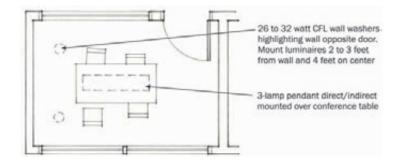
(EL15) Layout for Conference/meeting rooms.
